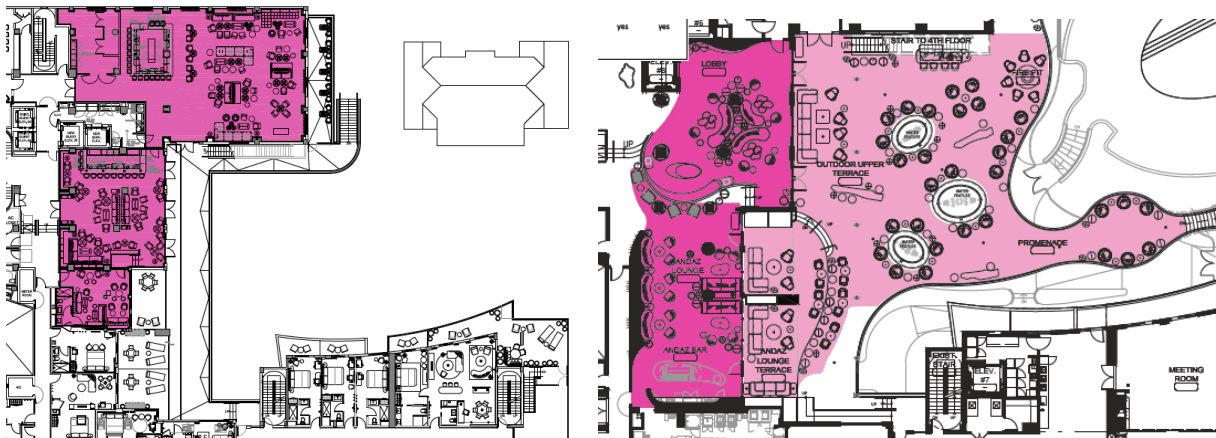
Renovated Second Floor Lobby and Lounge (Prior on Left, Proposed on Right)
